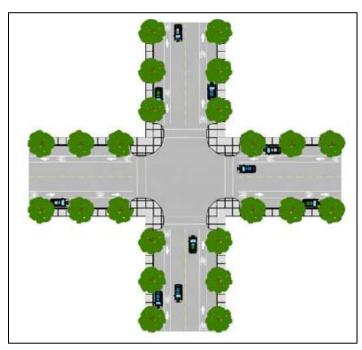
Bump outs shorten curb to curb pavement width, thereby allowing pedestrians to cross a roadway faster than if conventional curb cuts are provided. (Source: T&M Associates)
